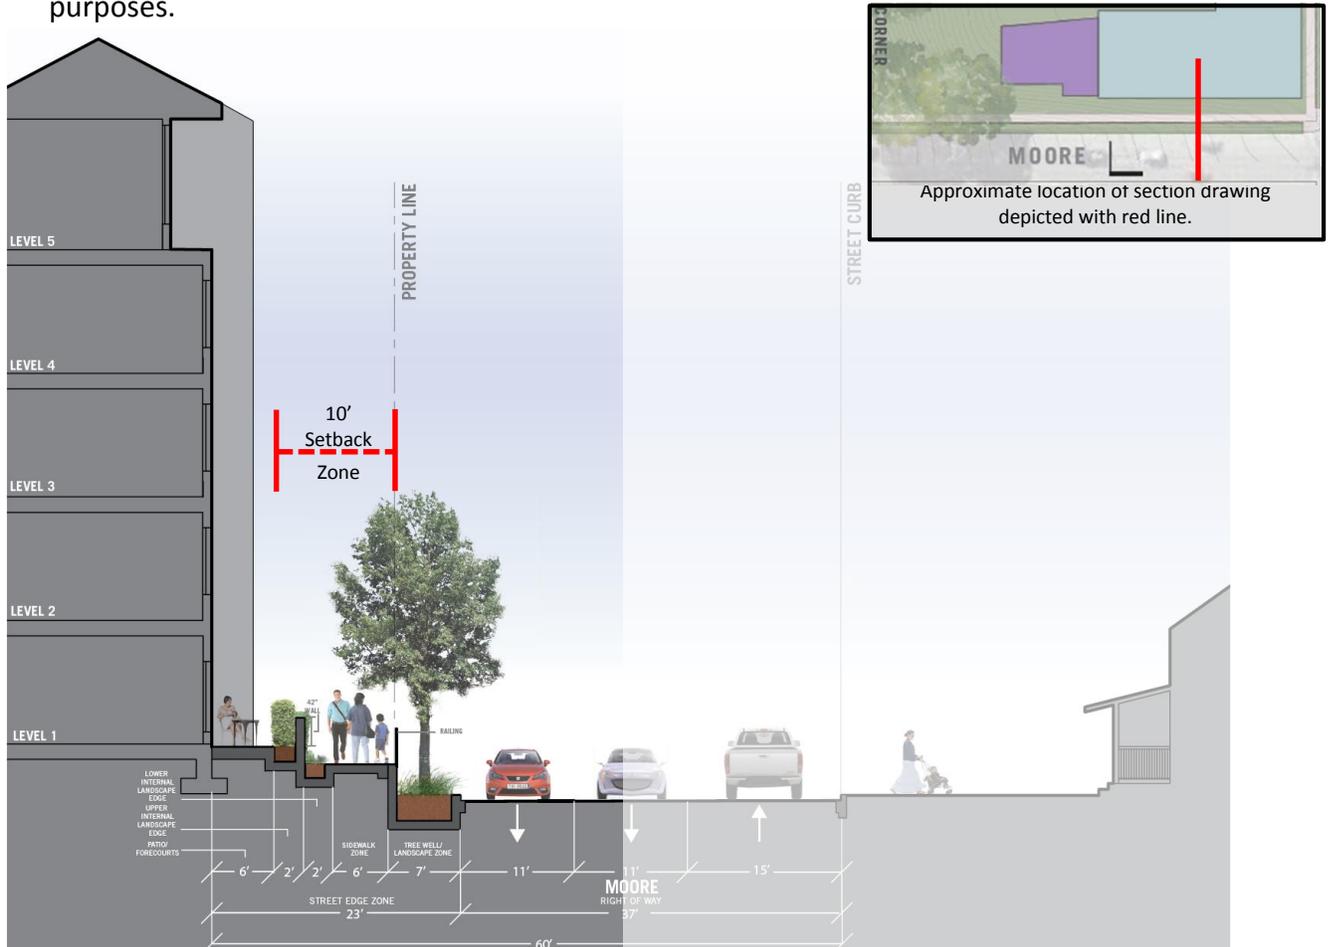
Moore Street streetscape design concept adjacent to multifamily building.
